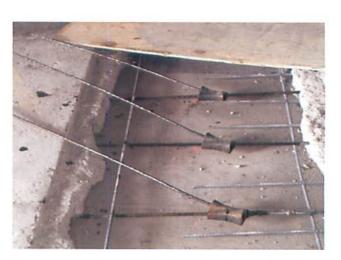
Intermediate Stressing Anchors for Slab Repair
